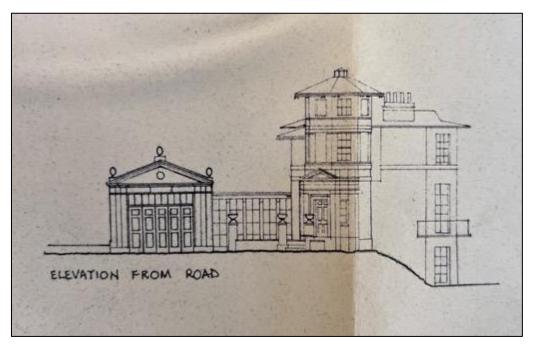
Drawing: Proposed alterations to tower house, No. 12, park Village West for W. Wyatt ESQ (drawing no 40/2D, 1958, by John Burkett ARIBA) (National Archive Ref CRES 35/3545)
